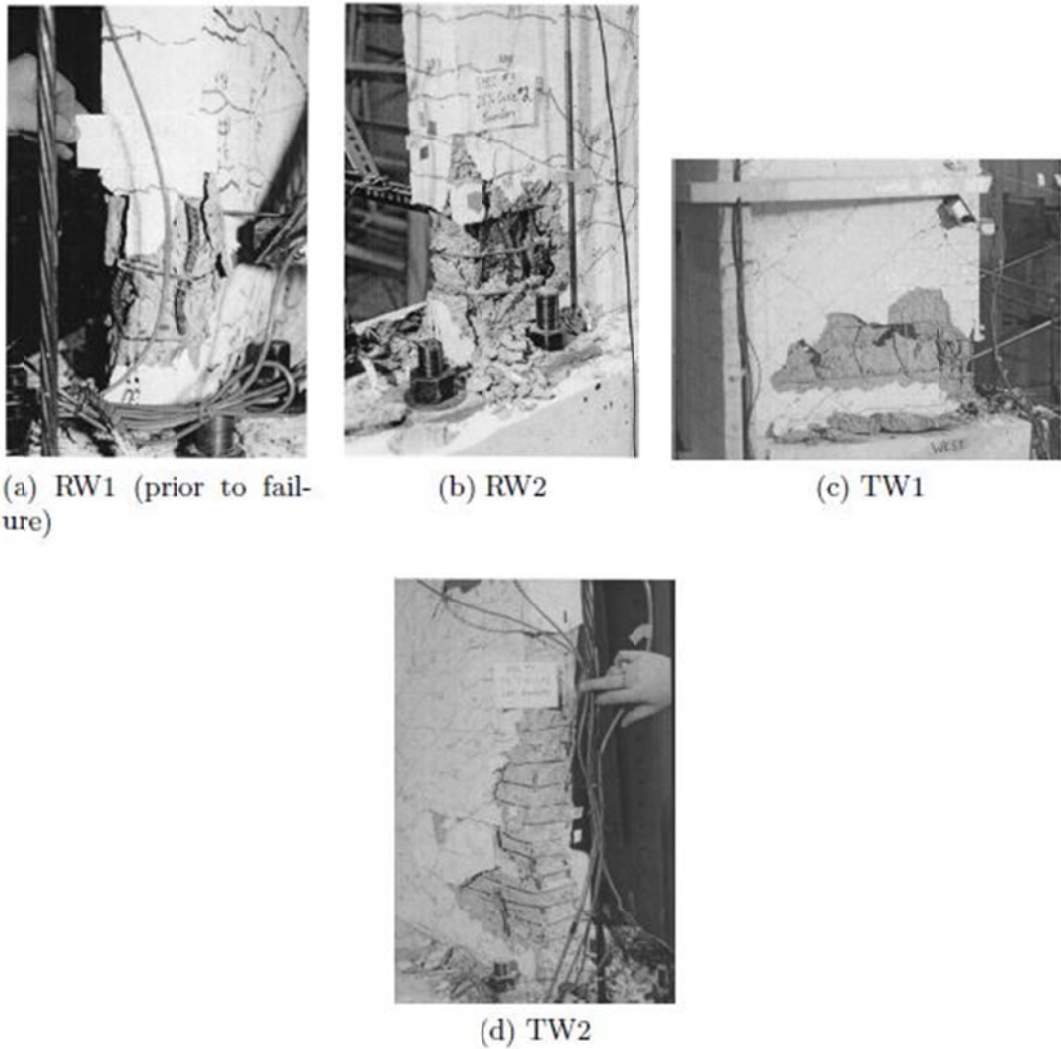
Damaged specimens of Thomsen and Wallace (1995 and 2004)
